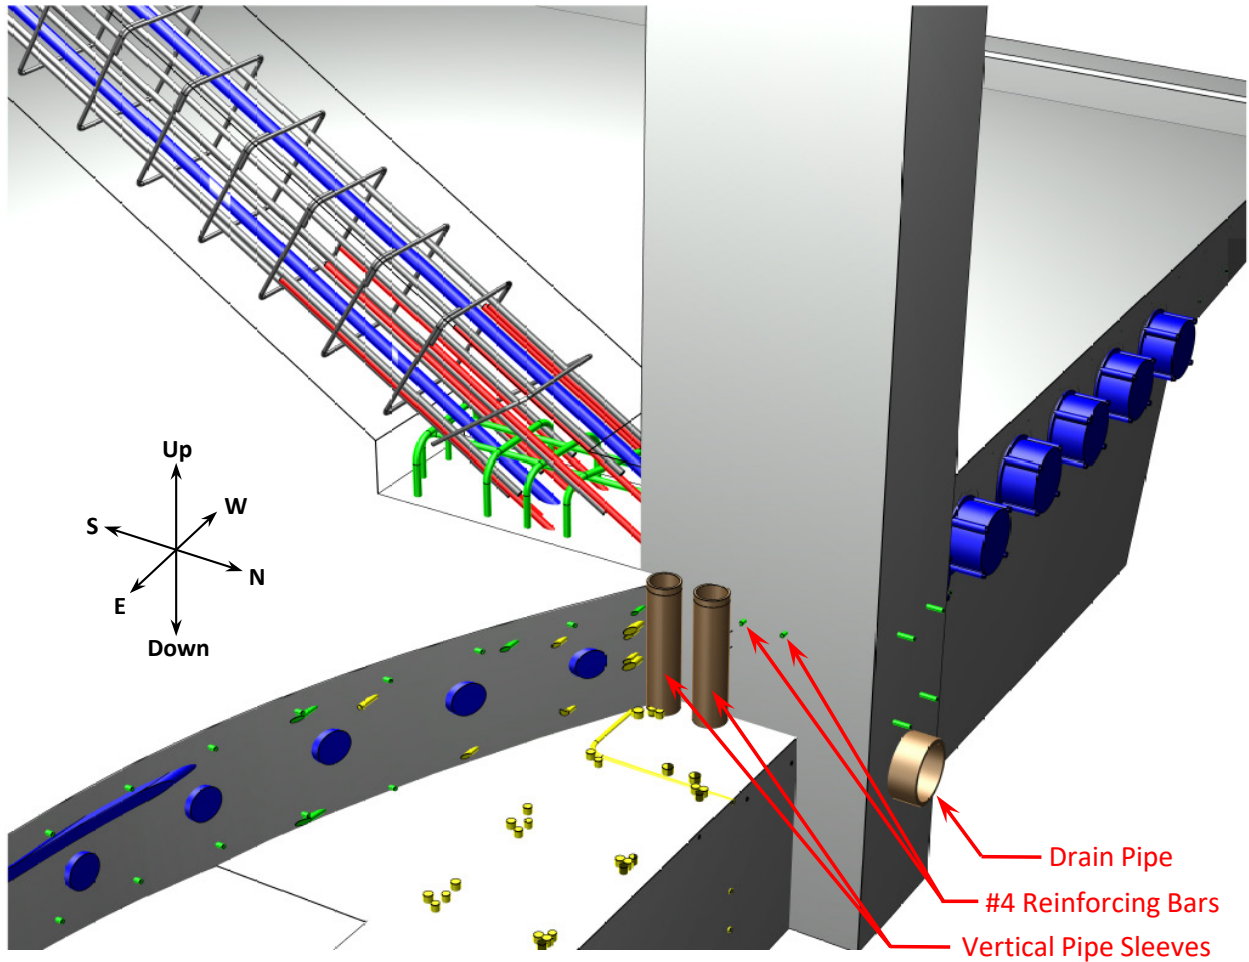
Cutaway illustration showing the reinforcing bars crossing and the conduit paralleling the shear plane below the east face of truss member 12.
